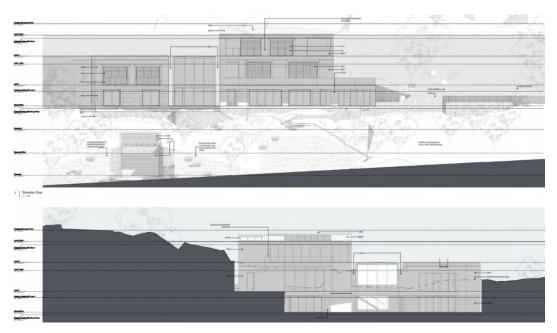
Top: Proposed east elevation from Whale Beach Road, Bottom: Proposed west elevation, Extract from Elevations Sheet 1 (Source: Drawing No. 2000, Rev. A)
